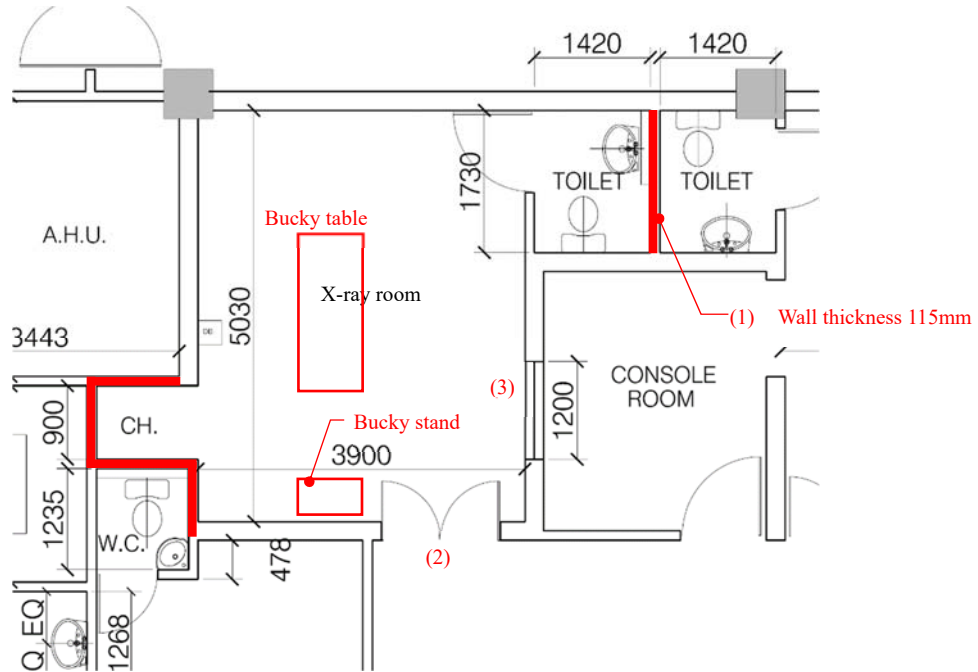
Equipment delivery route (Ground floor plan of ERRH)
